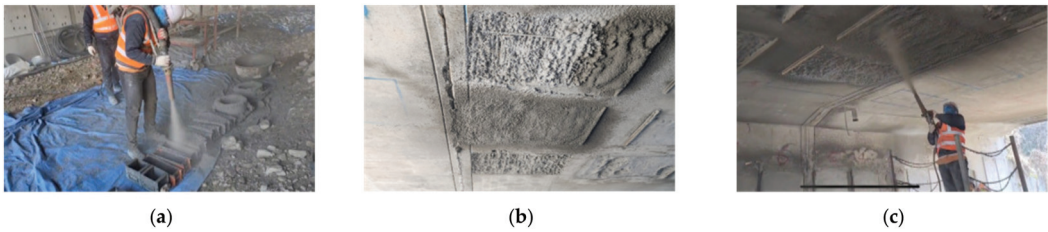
(a–c) Hydrodemolition and Dry shotcrete process in abandoned bridge. (a) Field sample preparation. (b) Repair section of after shooting. (c) Panoramic view of shooting.
